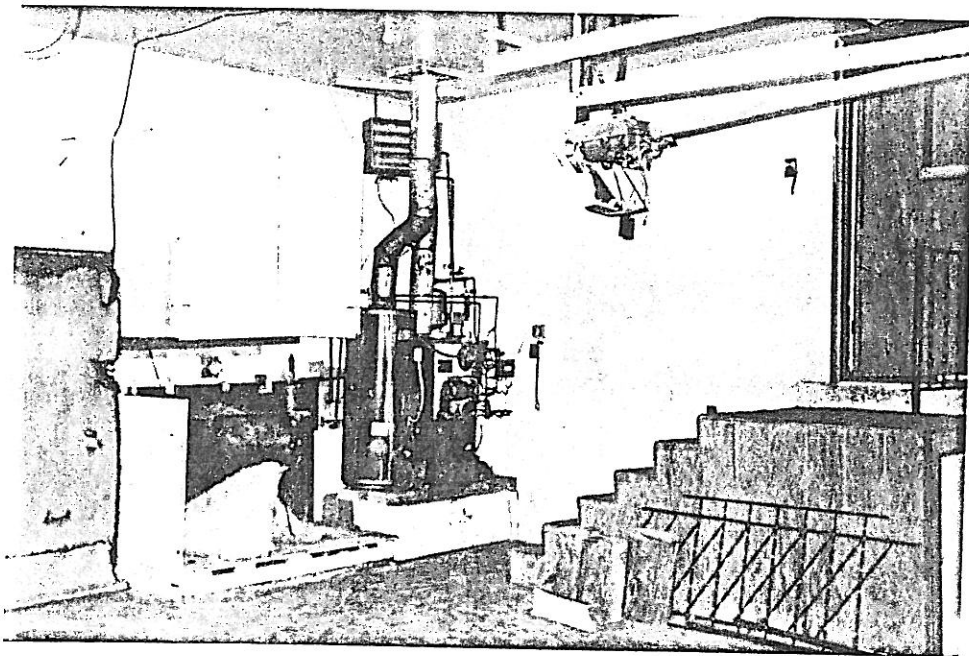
GARAGE AREA; FURNACE AND HOT WATER HEATER, BACK EXIT DOOR IS BEHIND CARPET AT LEFT.
